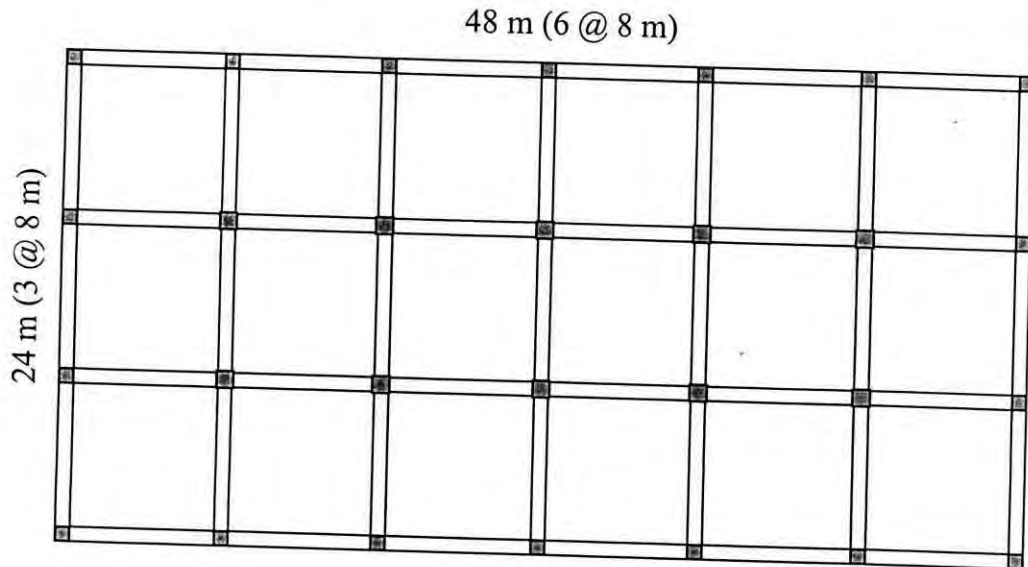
Plan of the Building Used for Calculating Design Wind Load.
